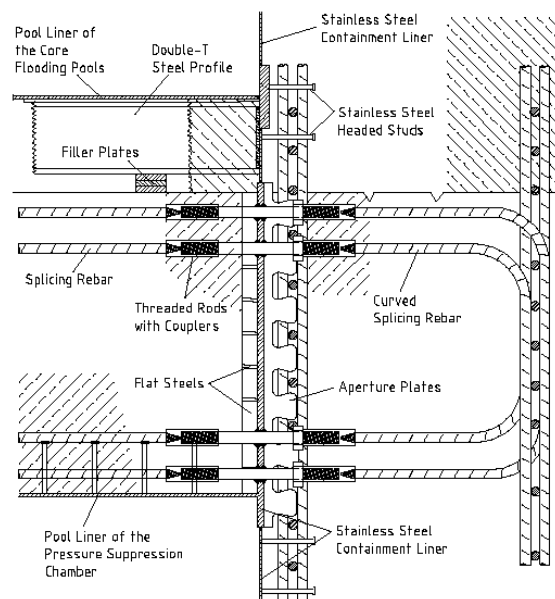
Special containment steel liner construction as rigid member connection for e.g. the pressure suppression chamber ceiling and the containment vessel wall
